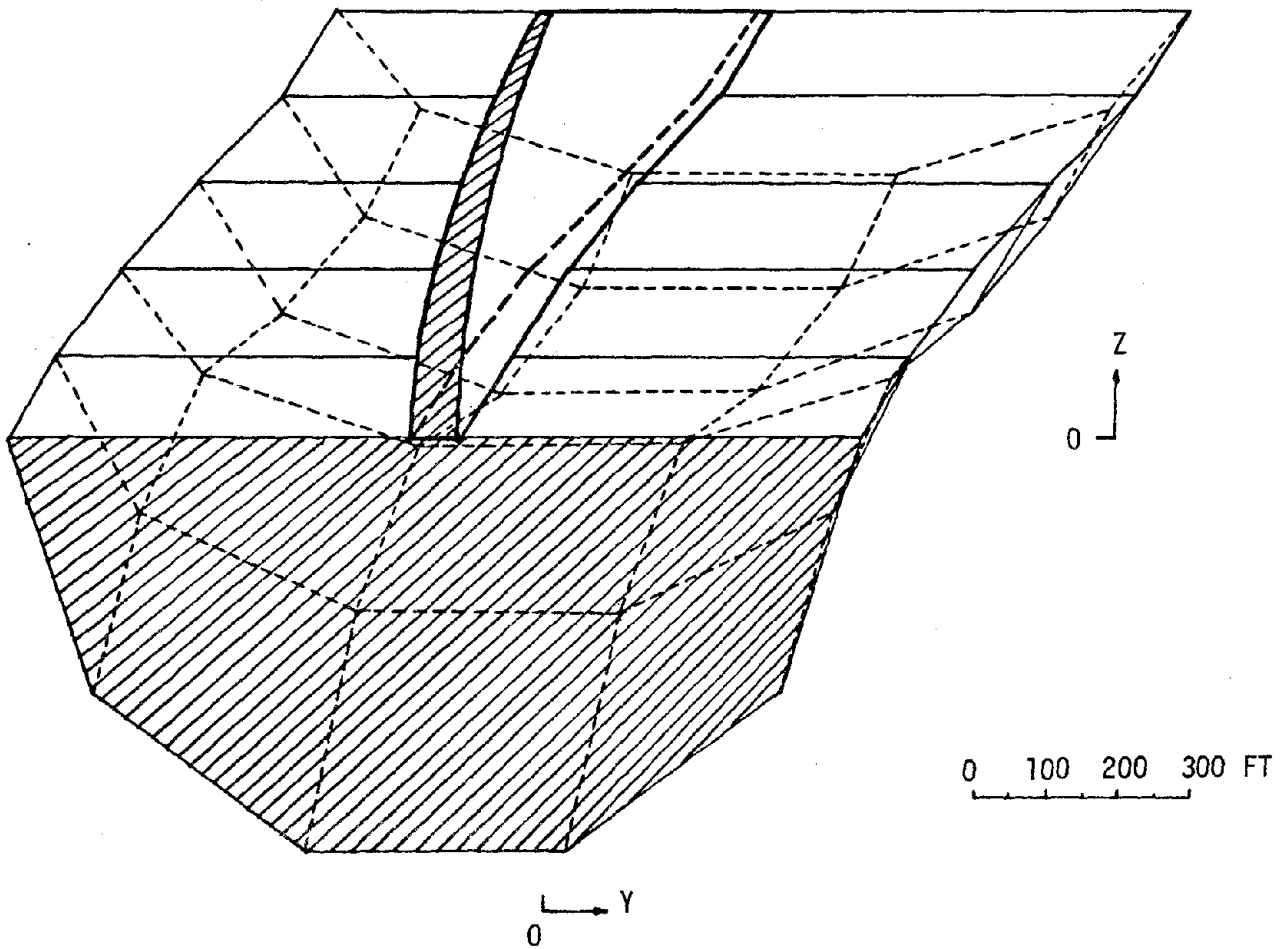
SECTION OF FOUNDATION BLOCK AND DAM AT Y-Z PLANE
